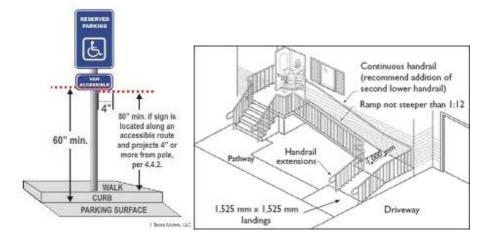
Proposed design solutions: designated accessible parking, ramps, handrails
